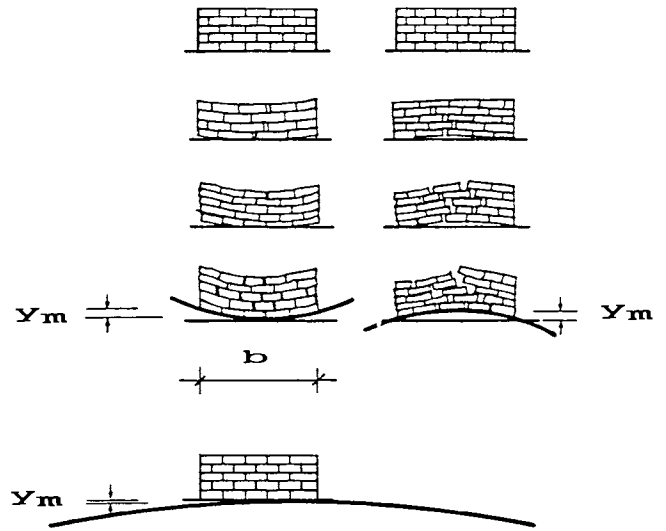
Cracking of a brick wall caused by cracking due to hogging and sagging, demonstrating the significance of wave length for building damage
